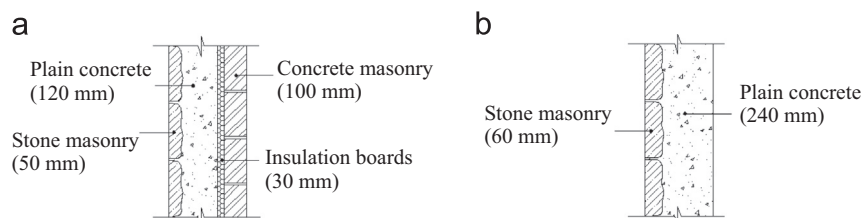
Cross-sectional details of stone–concrete walls. (a) Infill panel and (b) Bearing wall.
